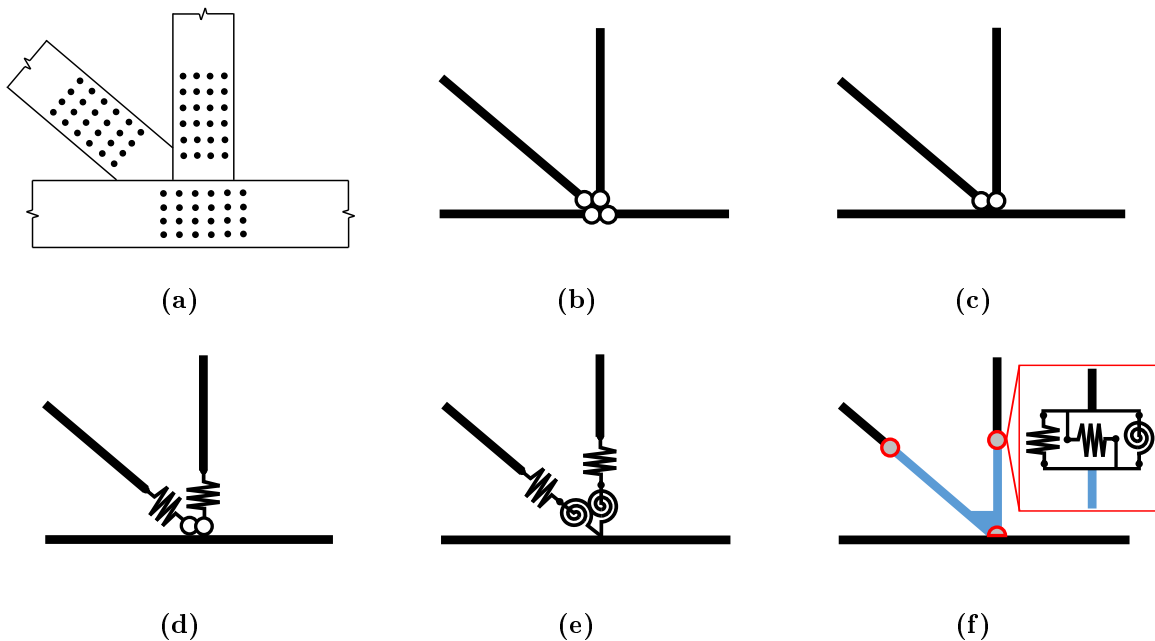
Modelling approaches for timber trusses with dowelled steel-to-timber connections; (a) schematic truss joint layout; (b) pinned connections; (c) continuous chords and web members with pinned connections; (d) continuous chords and web members with pinned connections with axial stiffness; (e) continuous chords and web members with connections with axial and rotational stiffnesses; (f) continuous chords, web members and chords with connections with axial, transversal and rotational stiffnesses, and accounting for the position of each connection via steel elements.
